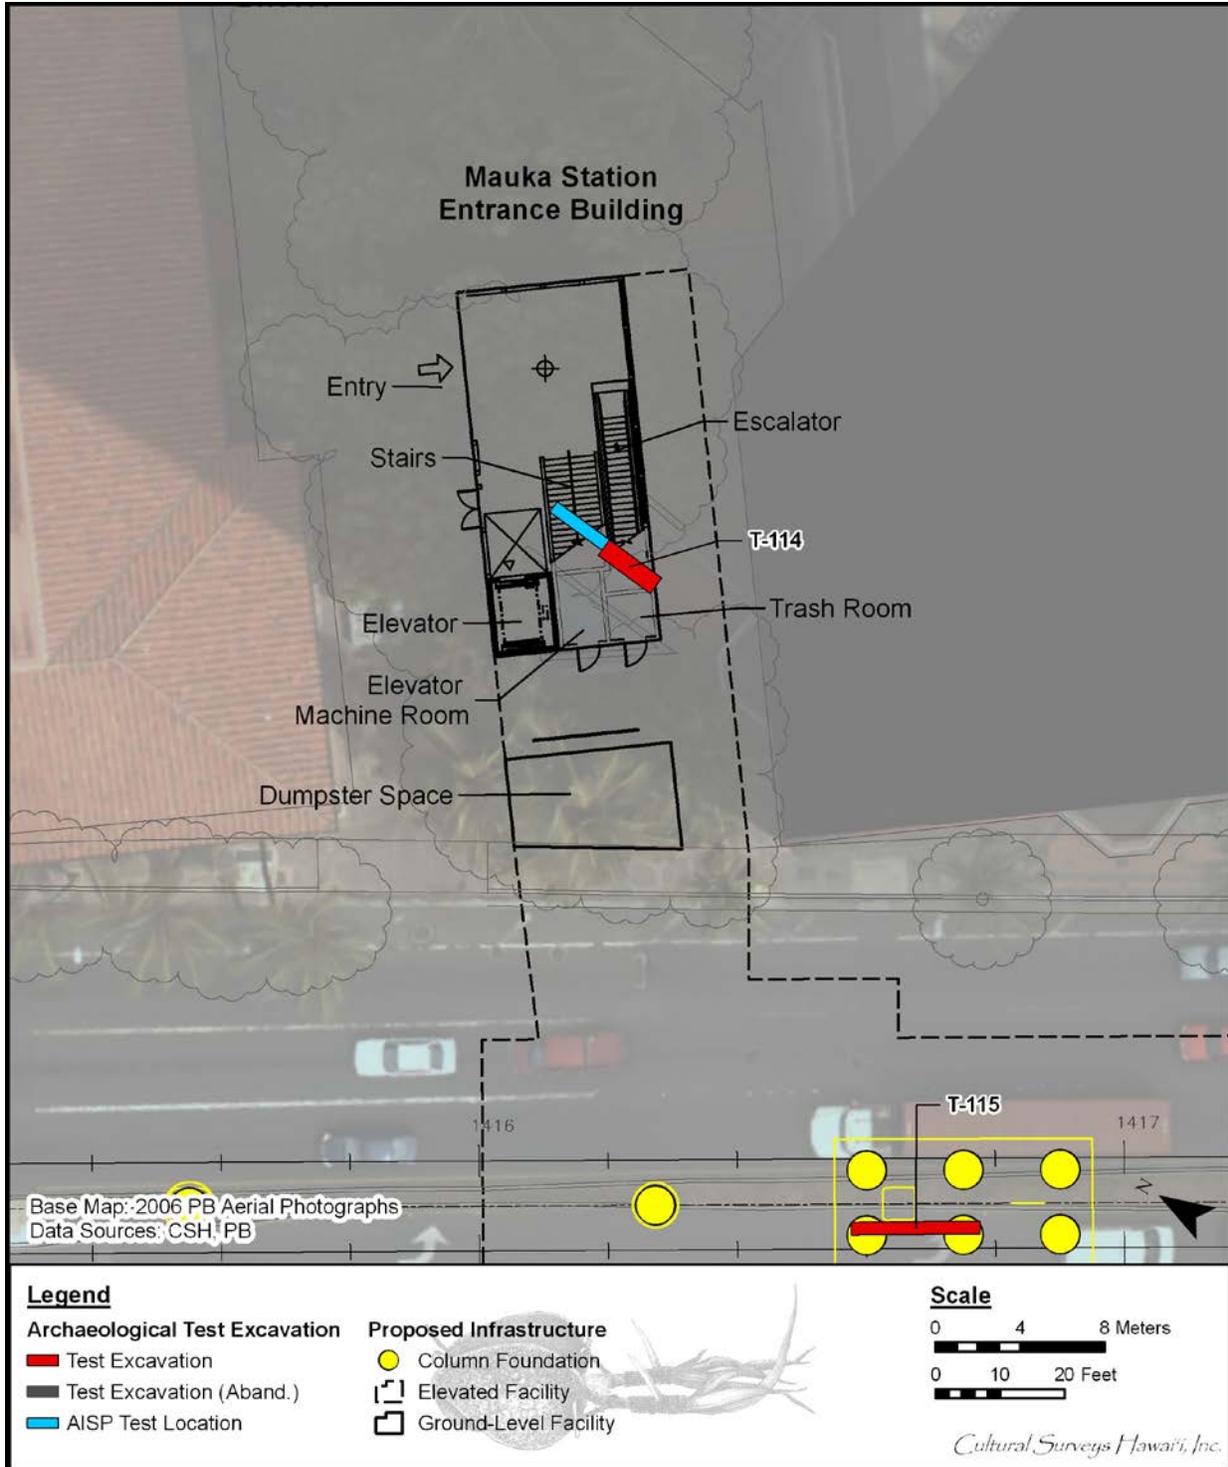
Downtown Station, detail of (*mauka*) Station Entrance Building at *mauka* side of Nimitz Highway showing locations of proposed AISP and actual AIS test excavations
